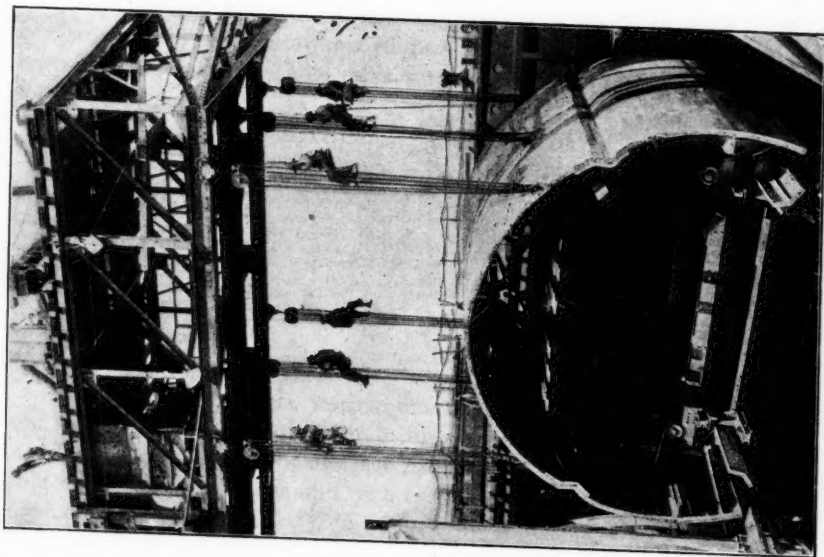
VIEW SHOWING SECTION OF INSIDE CROWN FORM BEING MOVED.
